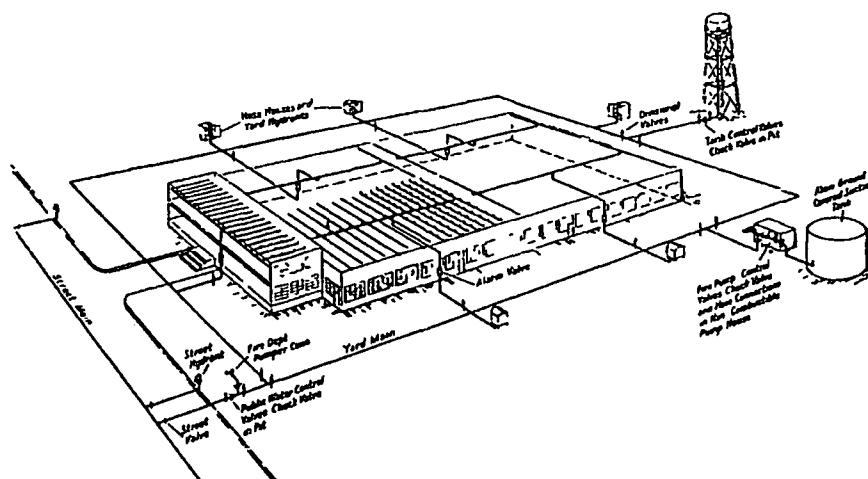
Typical automatic sprinkler installation for a modern industrial plant. Note sprinkler systems, yard mains, and water supplies.
